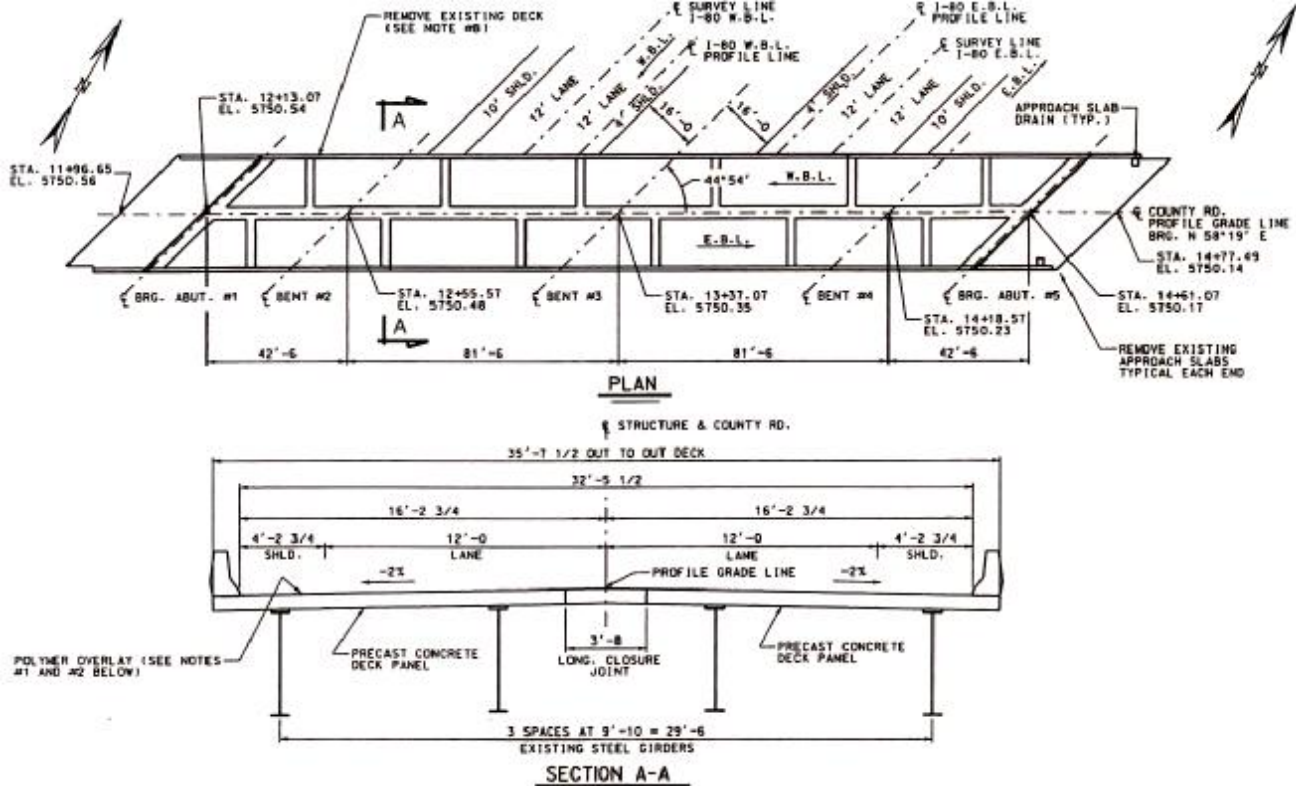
Plan view and cross section elevation of the C-437 structure over I-80 to Wanship
